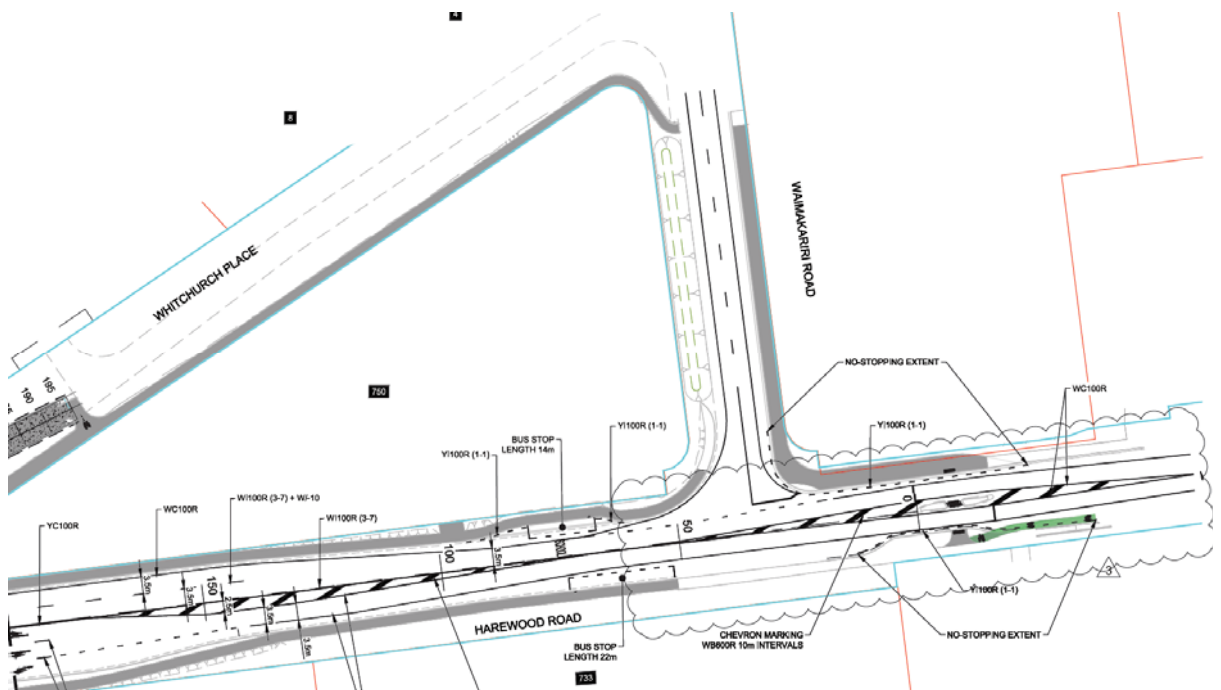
Harewood Road / Waimakariri Road Intersection Upgrade
